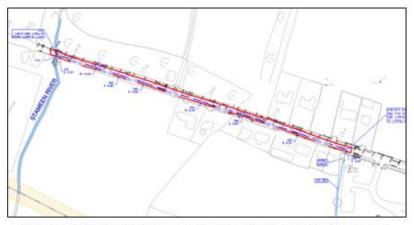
Extract of Surface Water Outfall Plan showing proposed surface water outfall pipe on Mill Road
